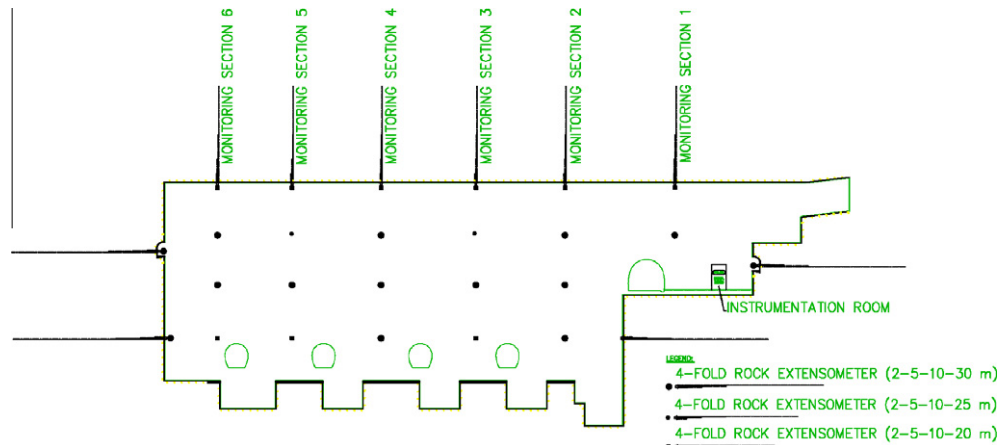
A longitudinal section of monitoring system with rock extensometers in powerhouse cavern.
